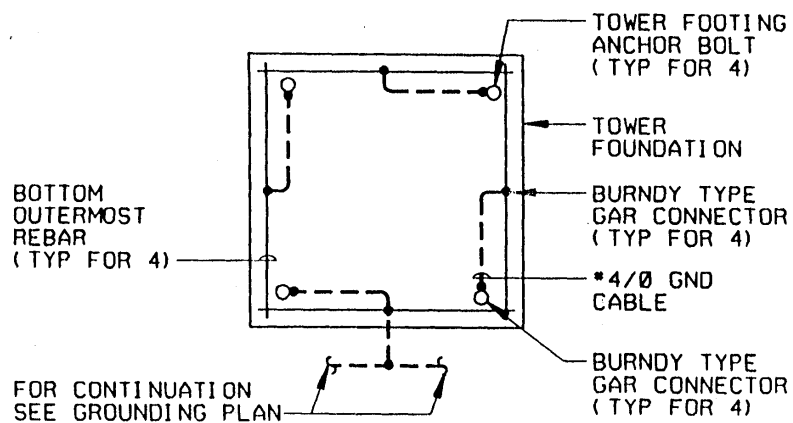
Detail of the drawing showing connection of the footing anchor bolts of the antenna tower to the reinforcement bar of the concrete foundation and then to the grounding grid.
